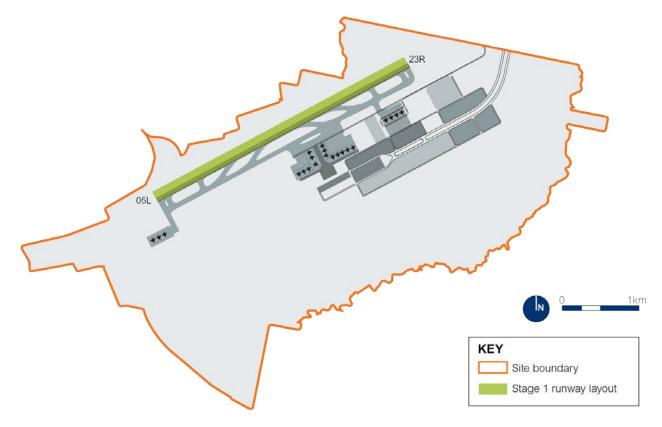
Stage 1 'northern runway' (05L-23R) layout
